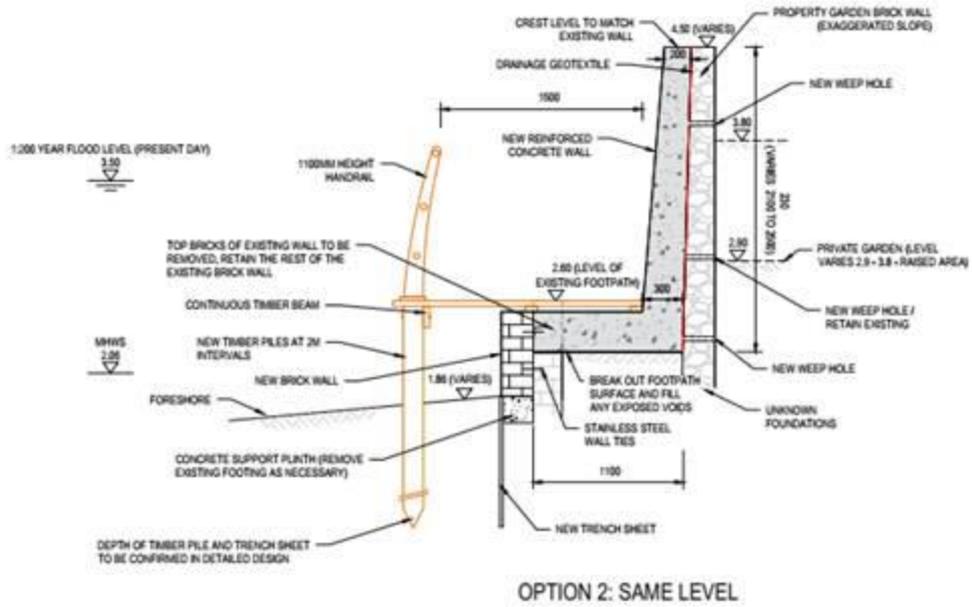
Sketch of indicative boardwalk and floodwall cross section in ODU 3f-h, using timber piles (not to scale)
